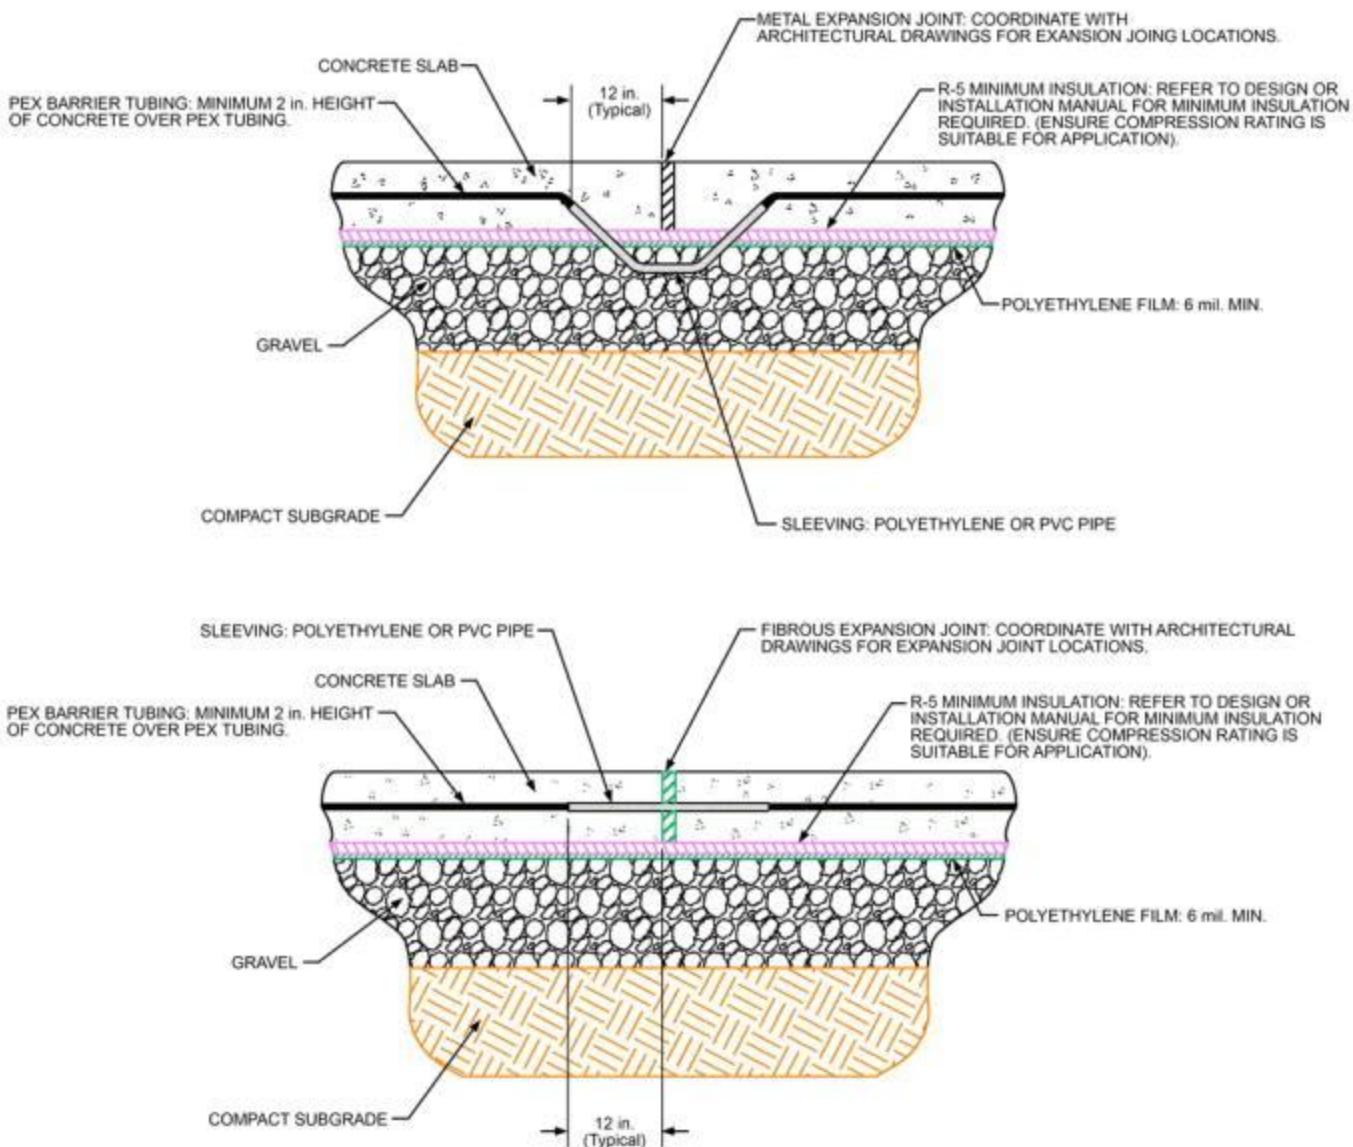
Piping Details for Concrete Construction for Metal and Fibrous Expansion Joints
